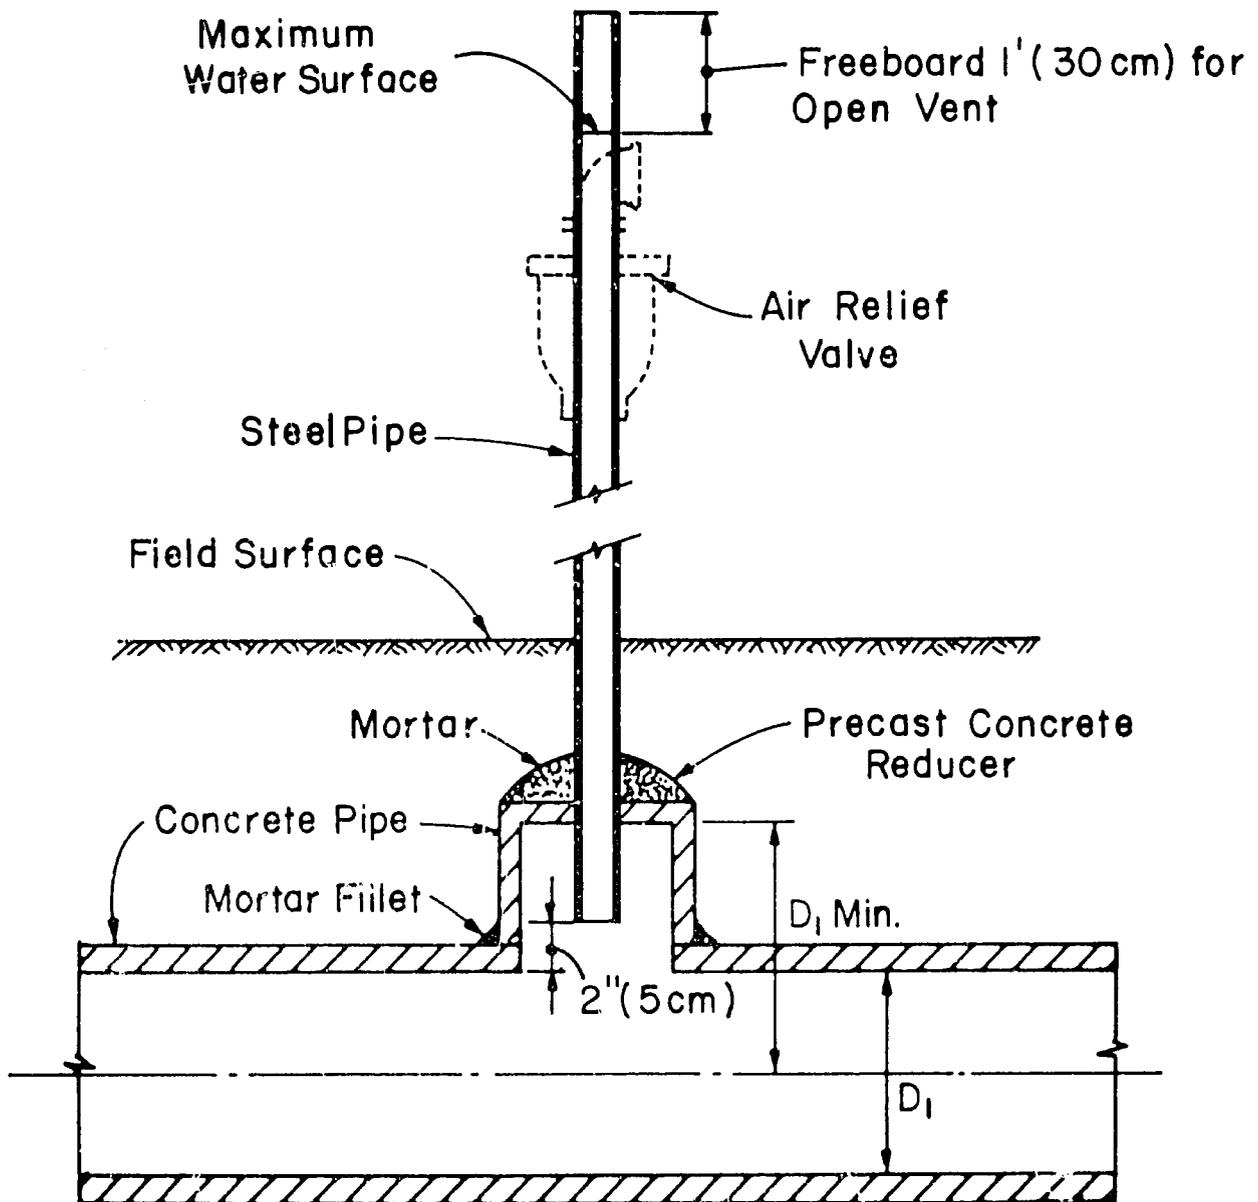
Air vent for underground pipelines. The vent pipe is sometimes allowed to project into the riser to form an air pocket and surge chamber in the top of the riser (4, 32).
